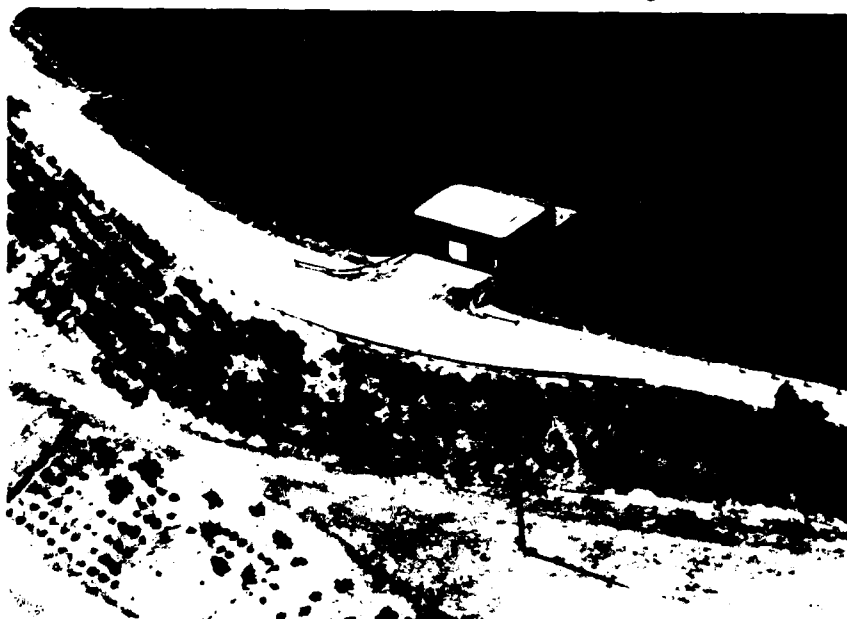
Aerial view of gatehouse and downstream slope of East Dam where shrubs have been planted.
